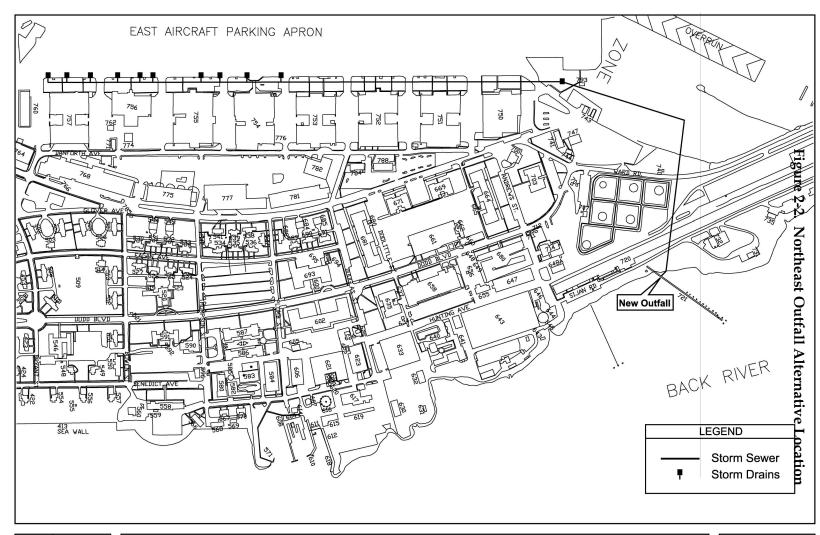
Northeast Outfall Alternative, Upgrade of Storm Water System, Langley AFB, Virginia
